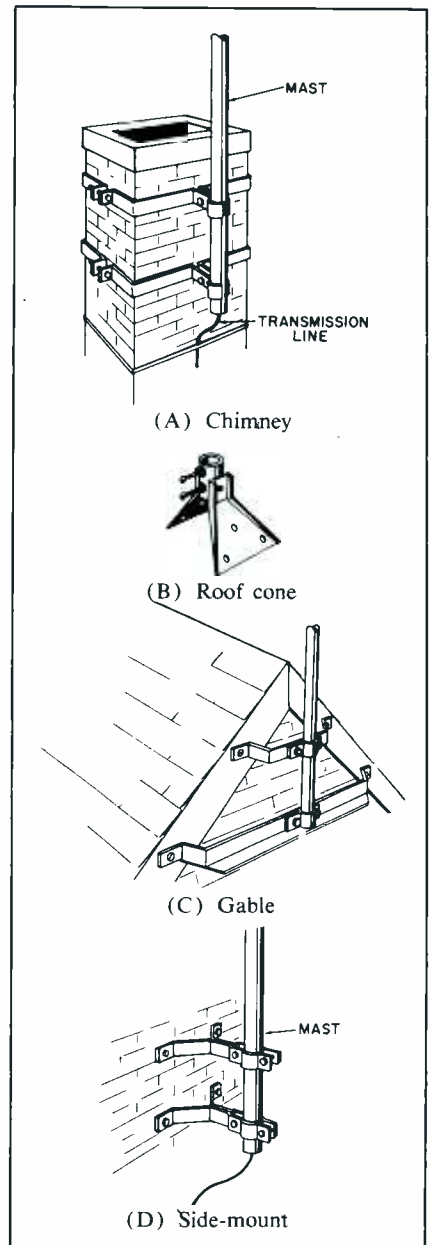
Mounting brackets for buildings. Additional tools will be required, such as an electric drill and some hard-tip masonry bits. After holes have been drilled, the mounting can be secured with special masonry
